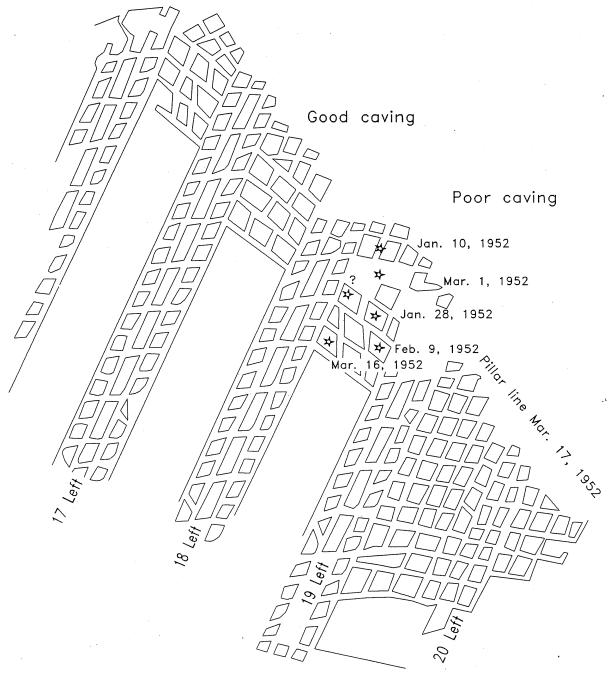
Barrier-Splitting Bumps in Adjacent Sections With Similar Layout Positions, Gary No. 2 Mine, January 1951.
